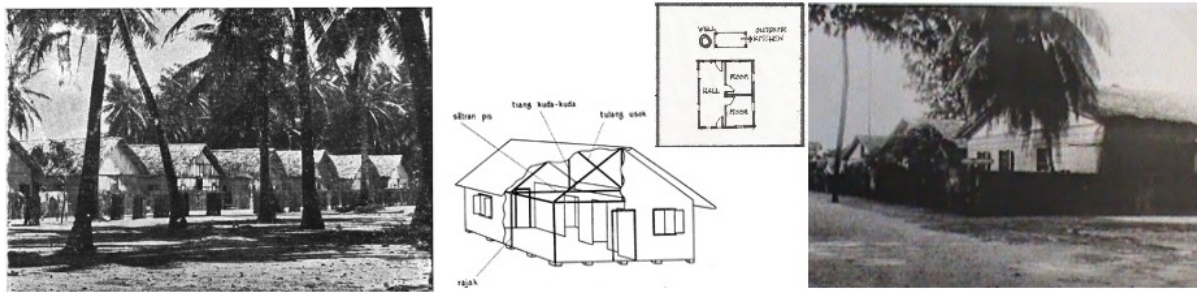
Early dwellings in the settlements; huts made of local timber and atap roof later replaced by brick and corrugated iron. The diagram shows the internal structure and their local Malay names. (Source: Authors' reconstruction after Gibson-Hill, C.C., 'Notes on the Cocos and Keeling Island' *JMBRAS*, VOLXX Part II, 1947.)
